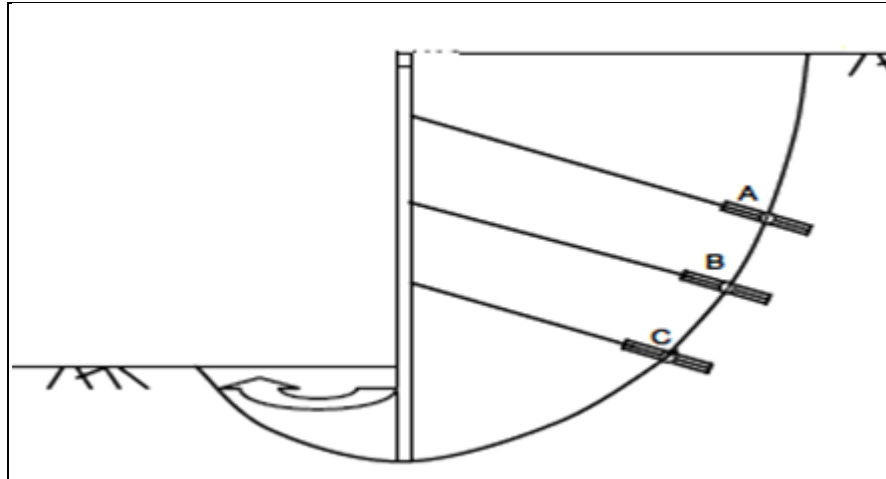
Overall instability failure due to rotation of wall and anchors altogether [60]
